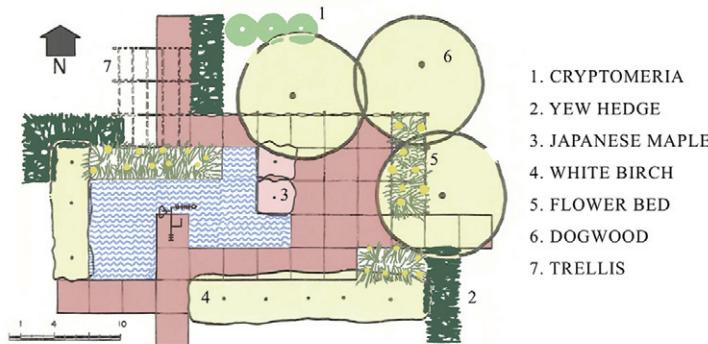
| Plan of the Pool Garden (credit: M. Zadeli, 2023).
